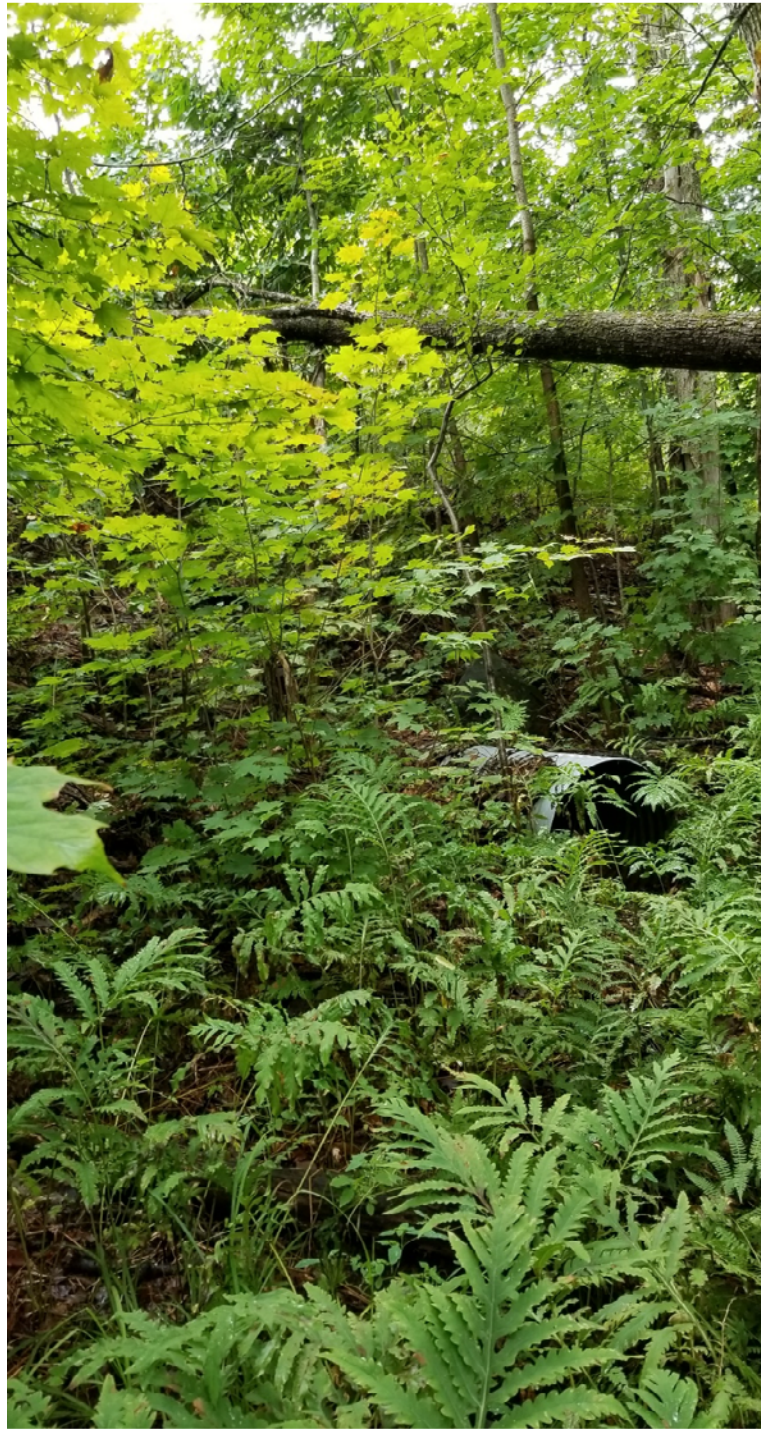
Looking Southwest at Culvert Outlet at Sta. 18+550 (2018/09/11)
